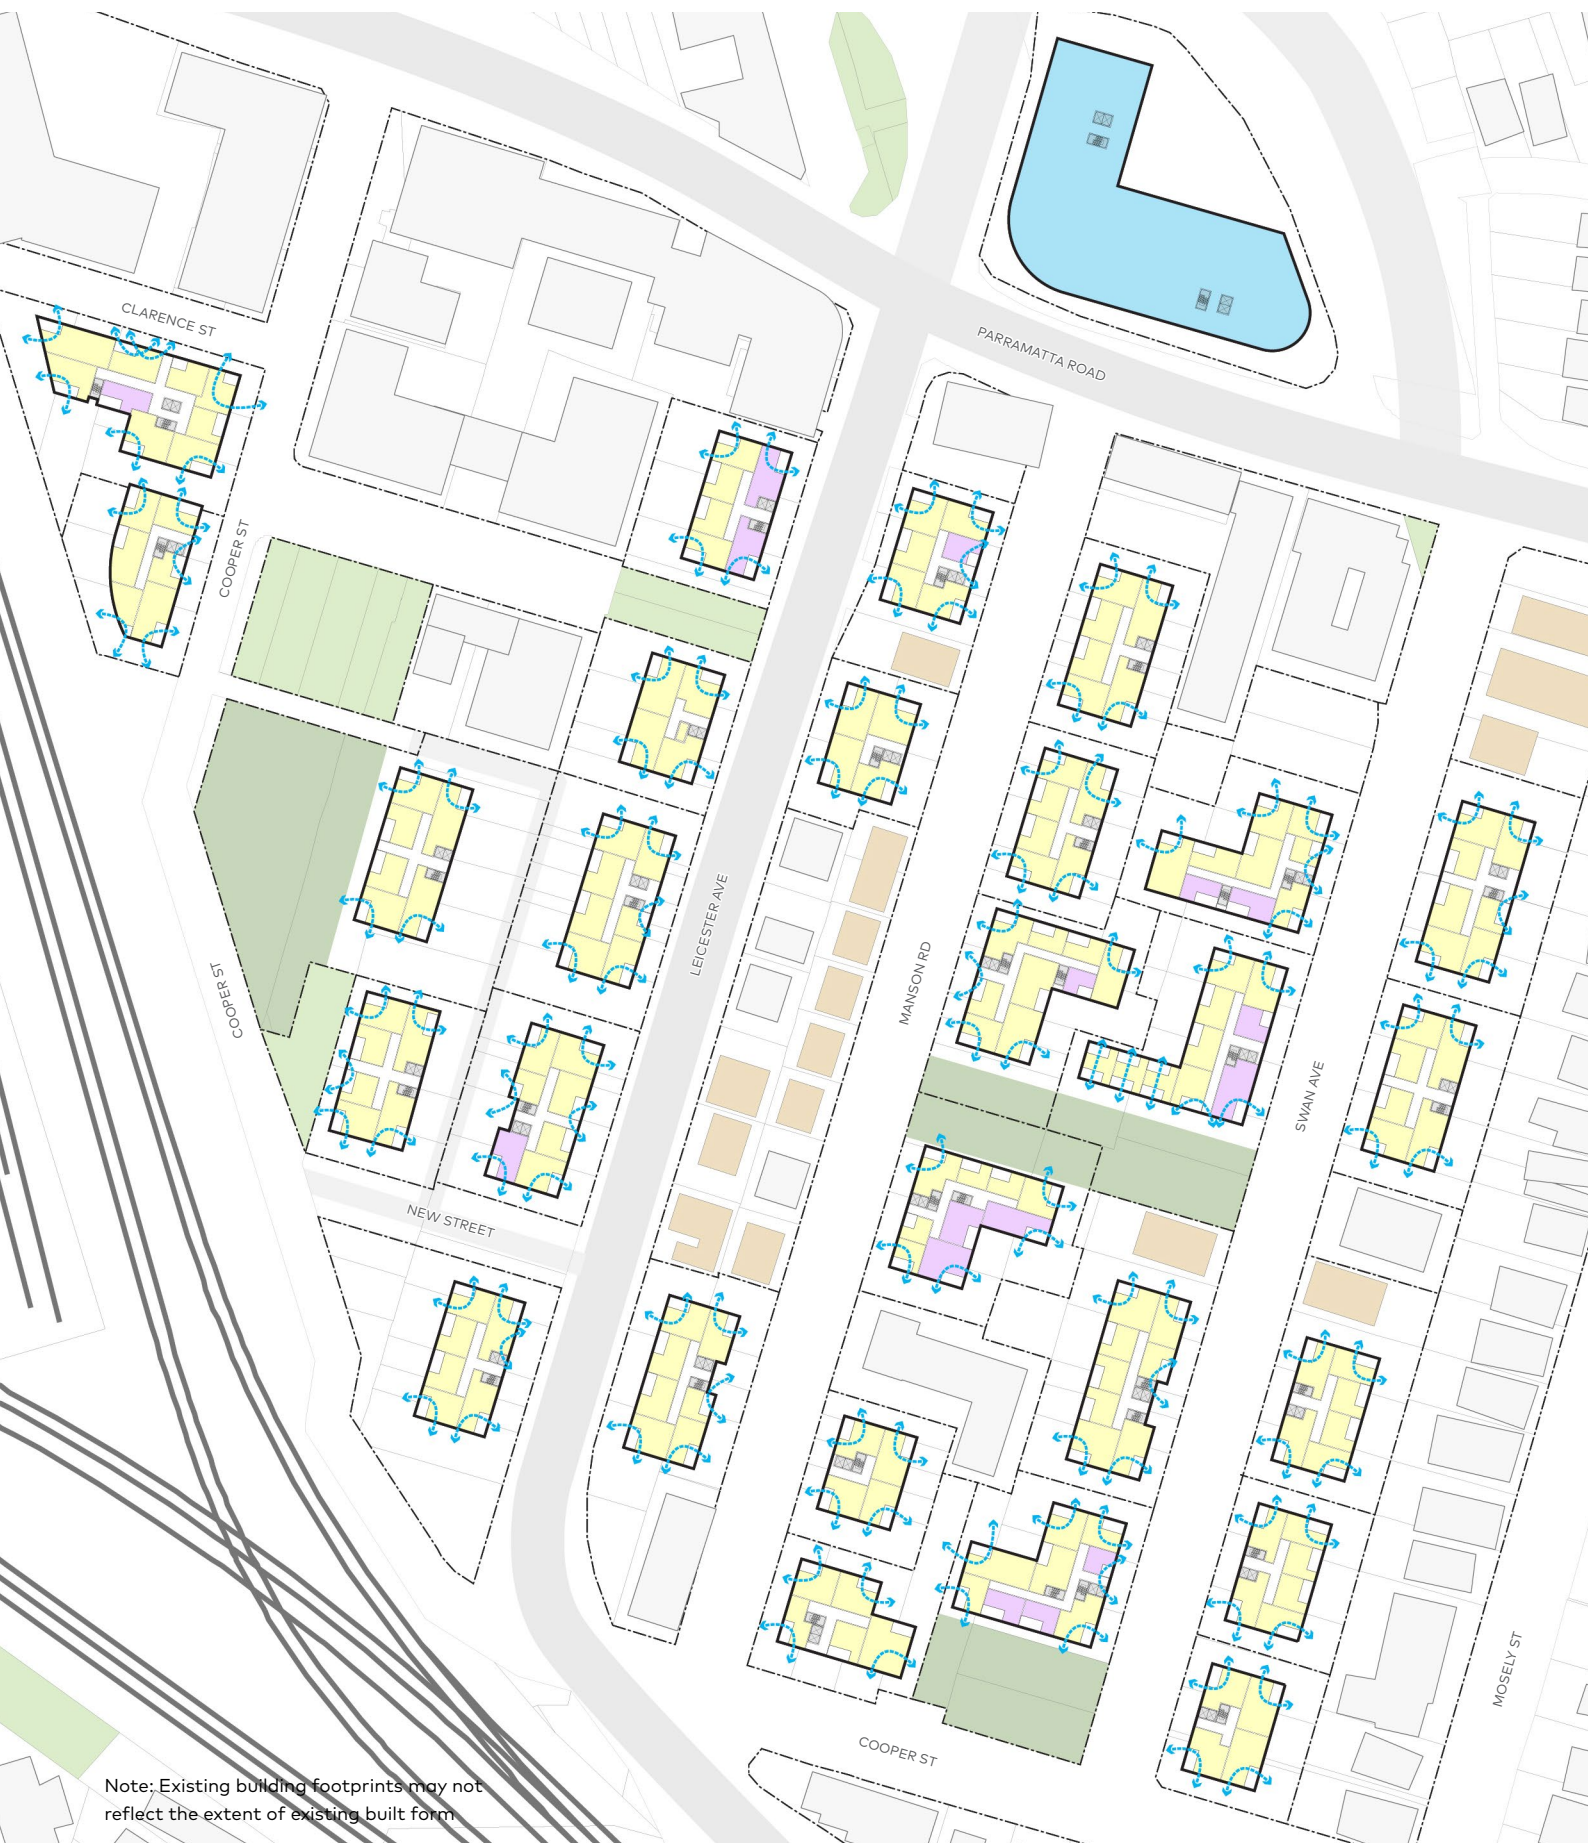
Typical lower level floors - Solar Access & Ventilation - Strathfield Triangle
